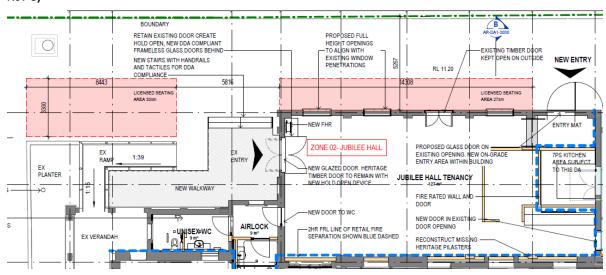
Proposed licensed outdoor seating areas (highlighted pink) associated with Jubilee Hall food and drink premises (Source: Architectural Drawing No. AR-DA1-1100, Rev C)
